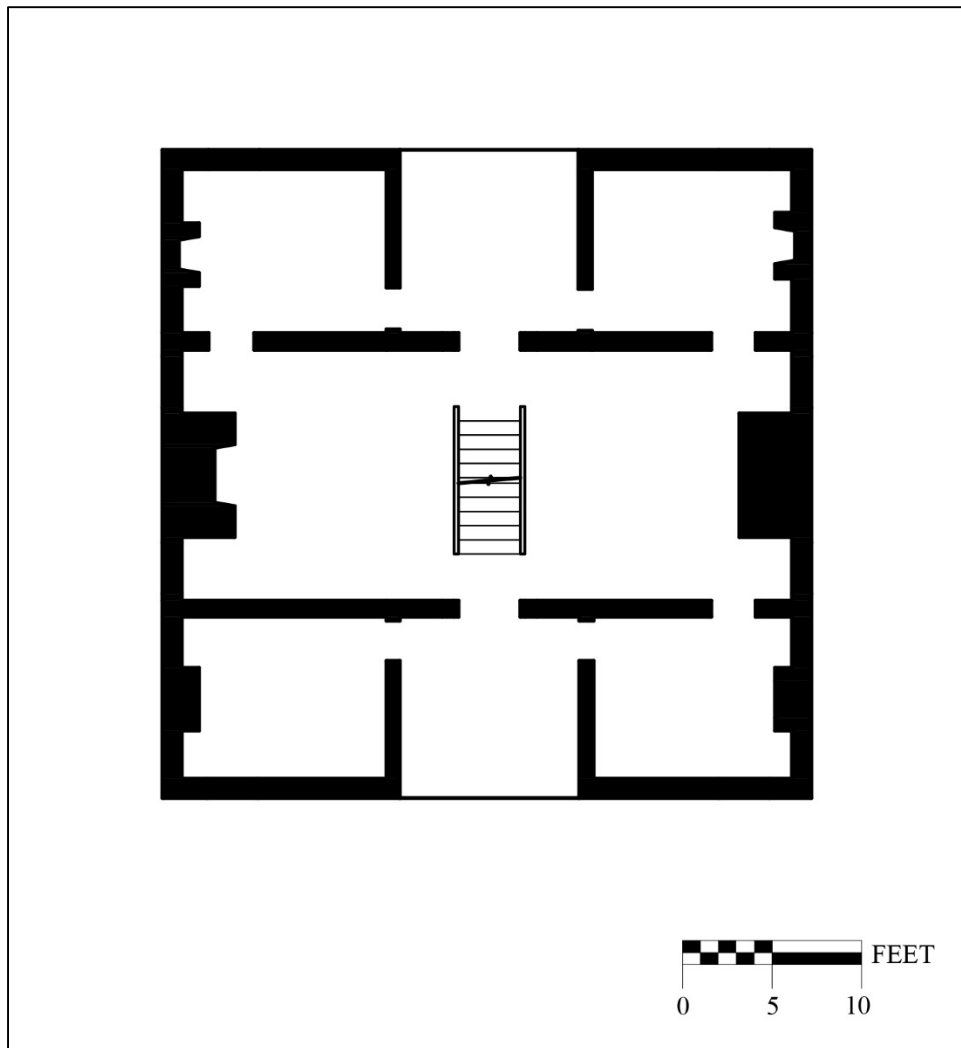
The Irvine House, first floor plan. Author, 2017.
